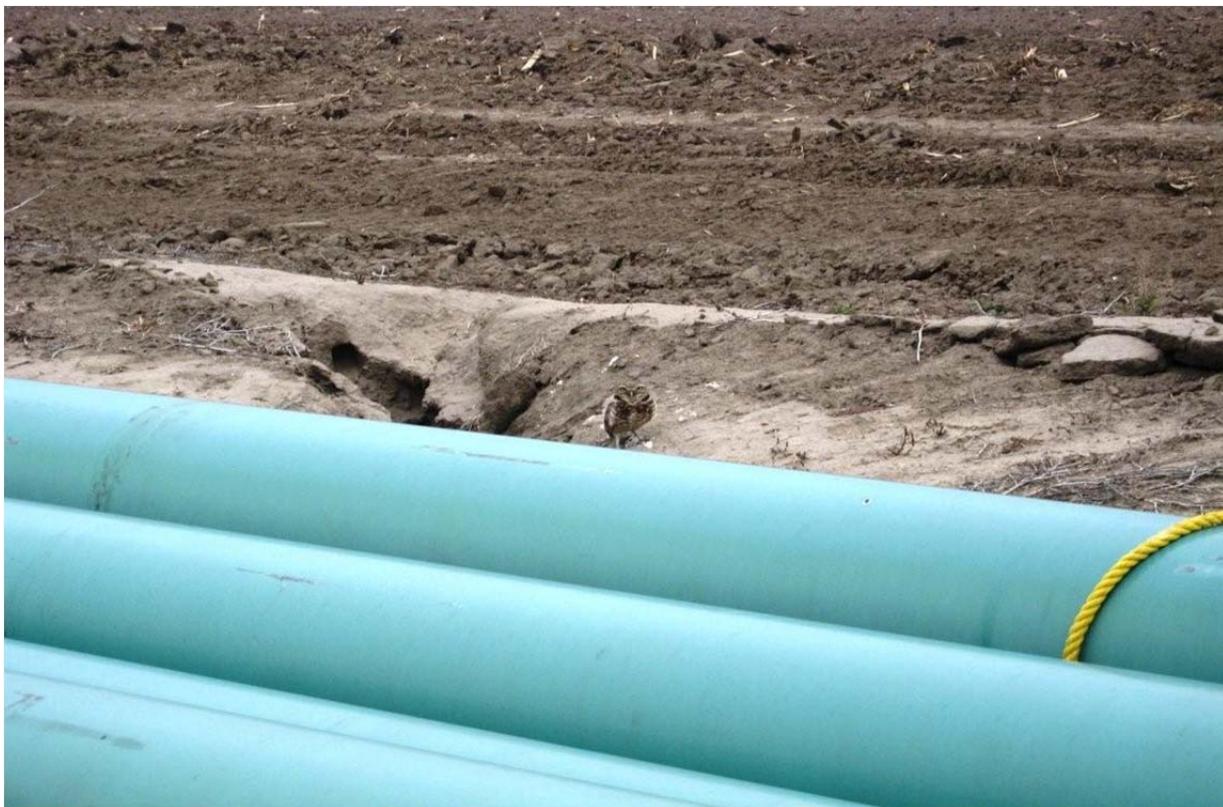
of burrowing owl observed in a dirt depression adjacent to the off loaded gas pipe just west of North Devries Road, 11/14/11.
